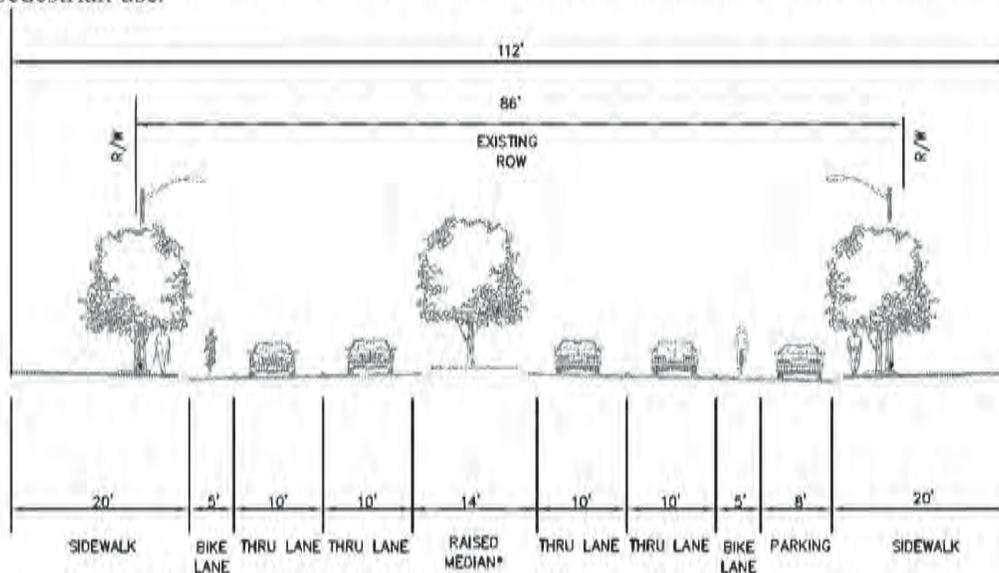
Proposed Cross Section, H Street Between Third Avenue and Broadway
